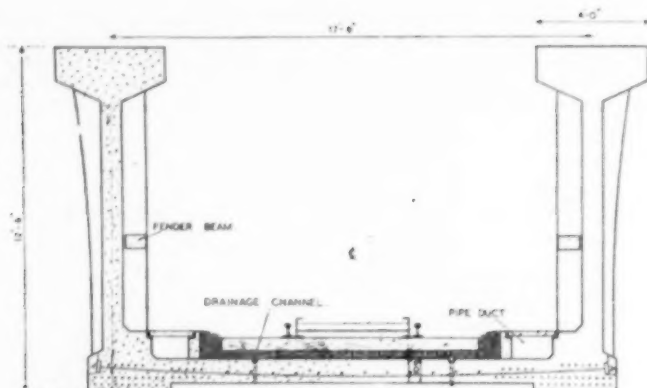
Cross Section of Bridge with Prestressed Deck.
